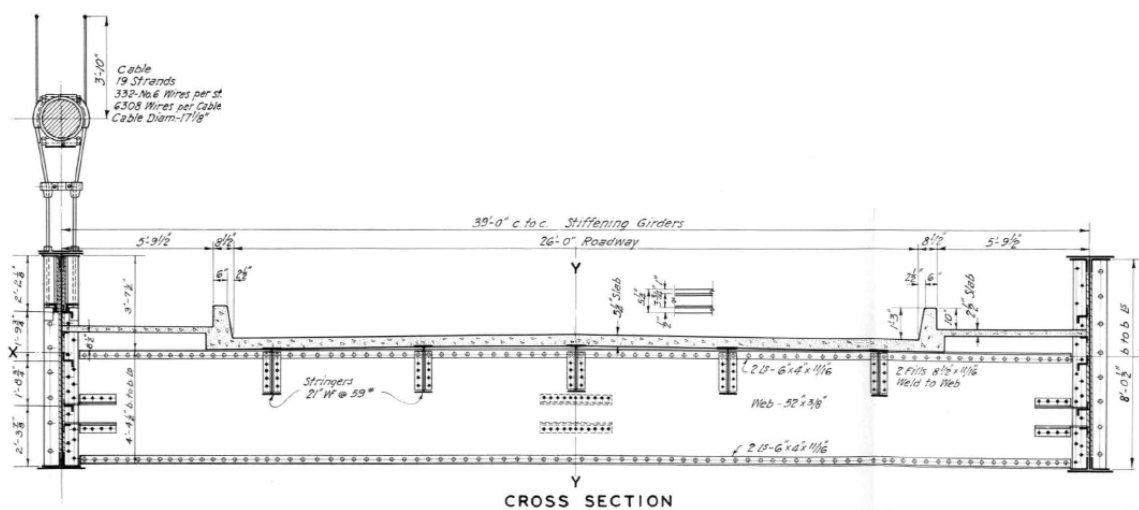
Cross section of the Tacoma Narrows Bridge, original drawing
